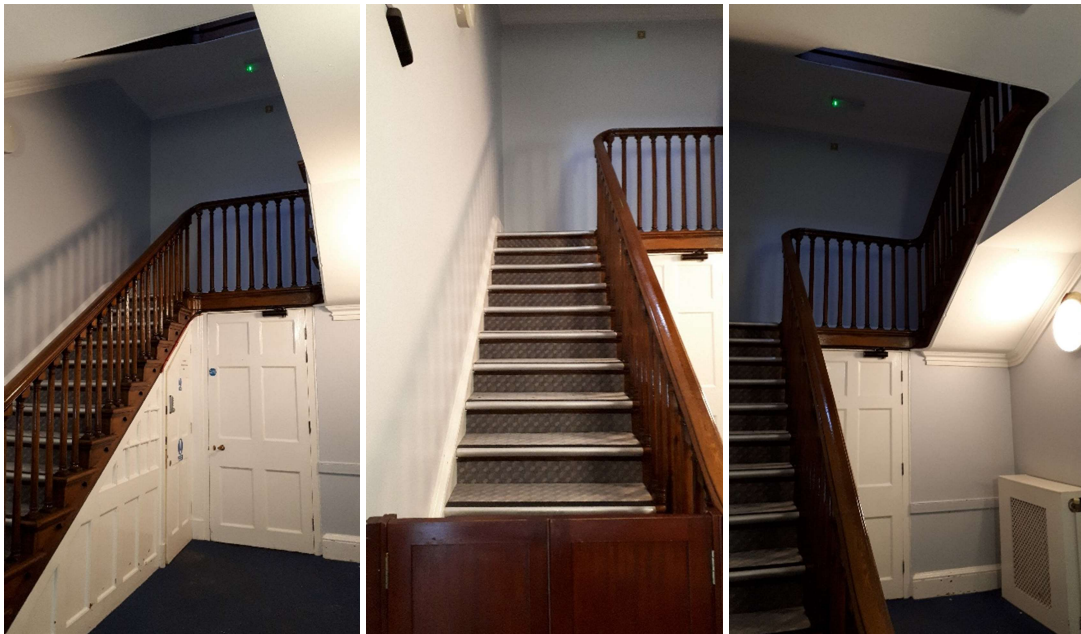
Service dogleg stair has an open stringer and steps are cranked down very slightly towards outer stringer.
